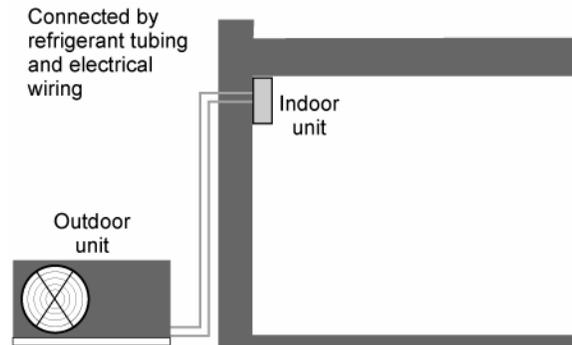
Ductless Split System with Wall-mounted Indoor Unit
